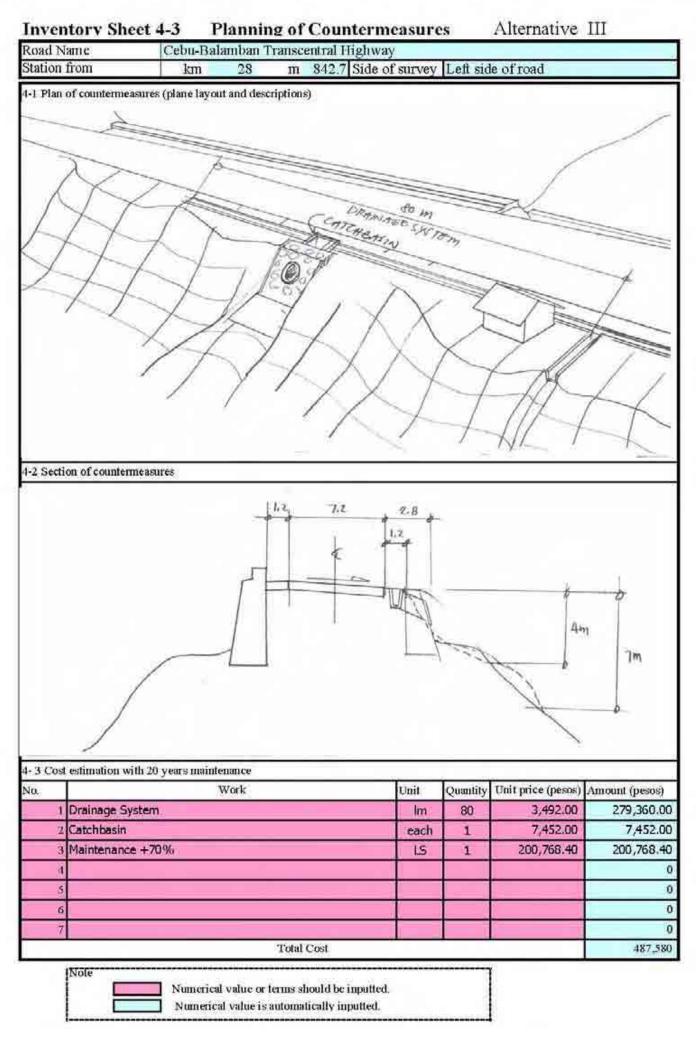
Example of Inventory Sheet 4-3: Planning of Countermeasure Alternative III for Road Slip
